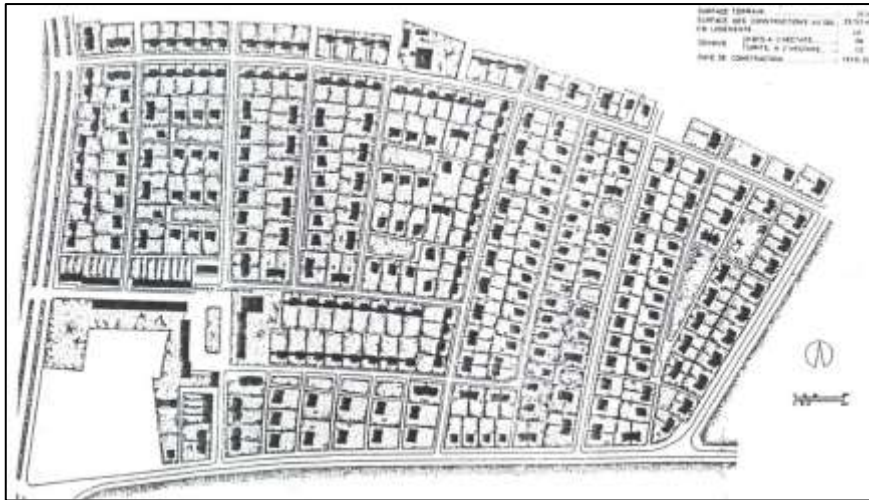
1. Levent Site Plan - (Gayretli, 2016)
